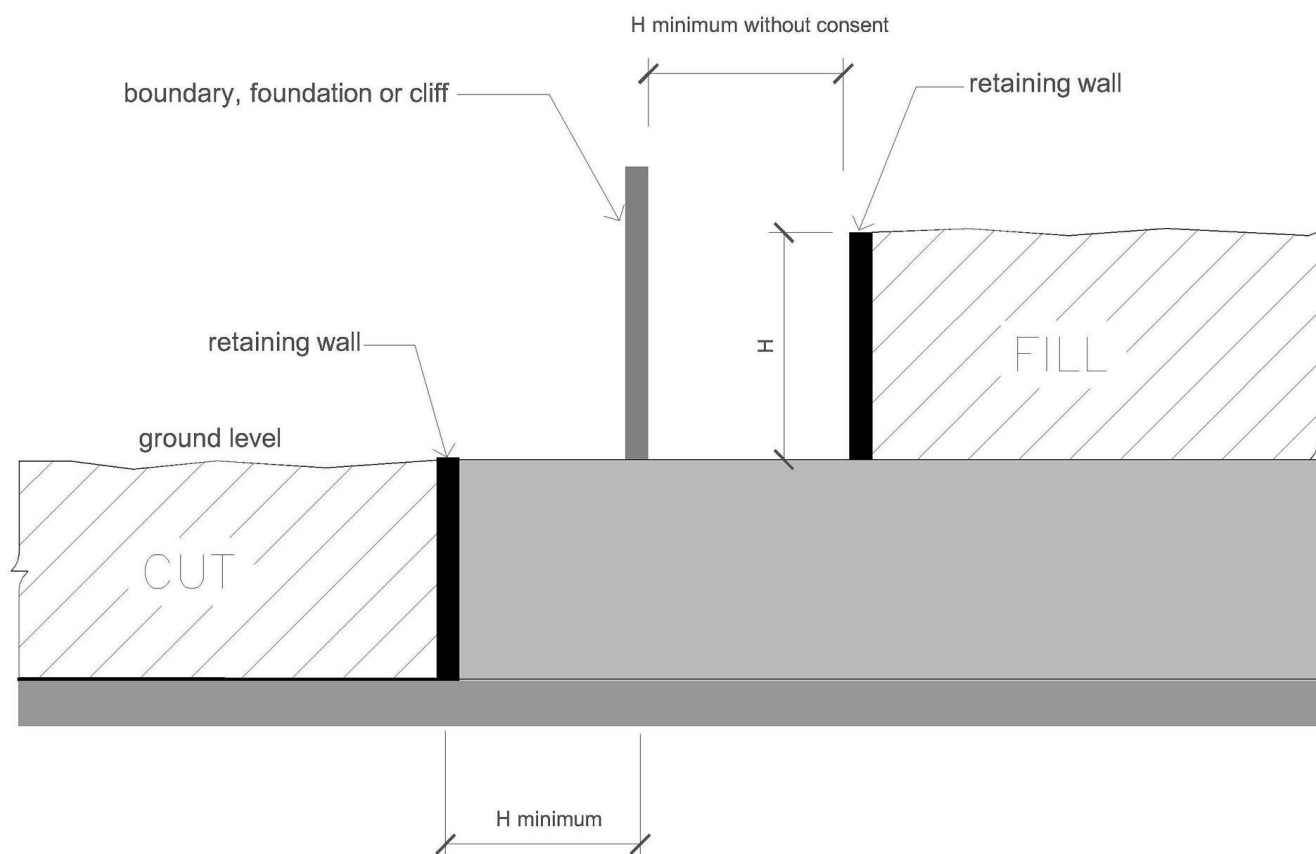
B: Cut and fill supported by retaining walls (elevation view)
